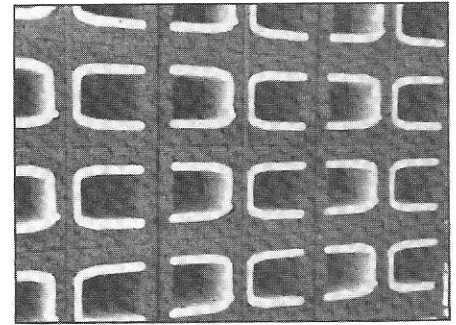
Korfil inserts are installed at the block Manufacturing Plant prior to delivery. \*\*\*Structural Tests of 8 inch Grouted Concrete Masonry Walls Containing Korfil inserts", NCMA, January, 1978 and "Structural Tests for the Determination of Comparative Characteristics Between Grouted Concrete Masonry Specimens Containing Korfil II Inserts and Conventional Construction, NCMA, January, 1979.
